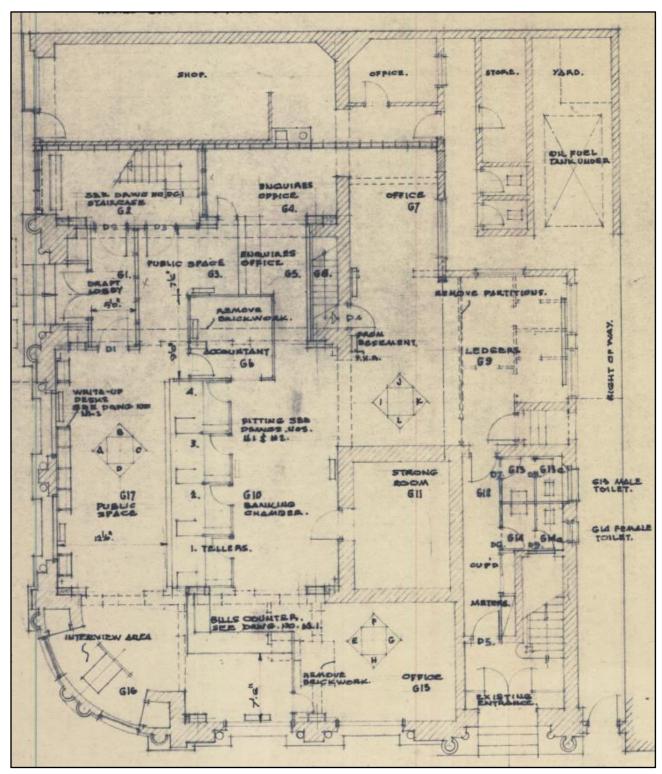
Detail from 1968 plan of the Bank of New South Wales, showing the ground floor plan of the building (Duffill Watts & King, 1968).
